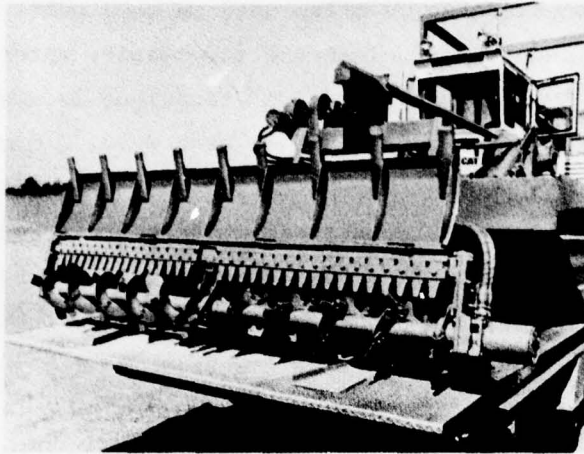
Horizontal cutterhead of the Mud Cat dredge showing cutter knives and spiral auger (Courtesy of MUDCAT Division National Car Rental Systems, Inc.)
